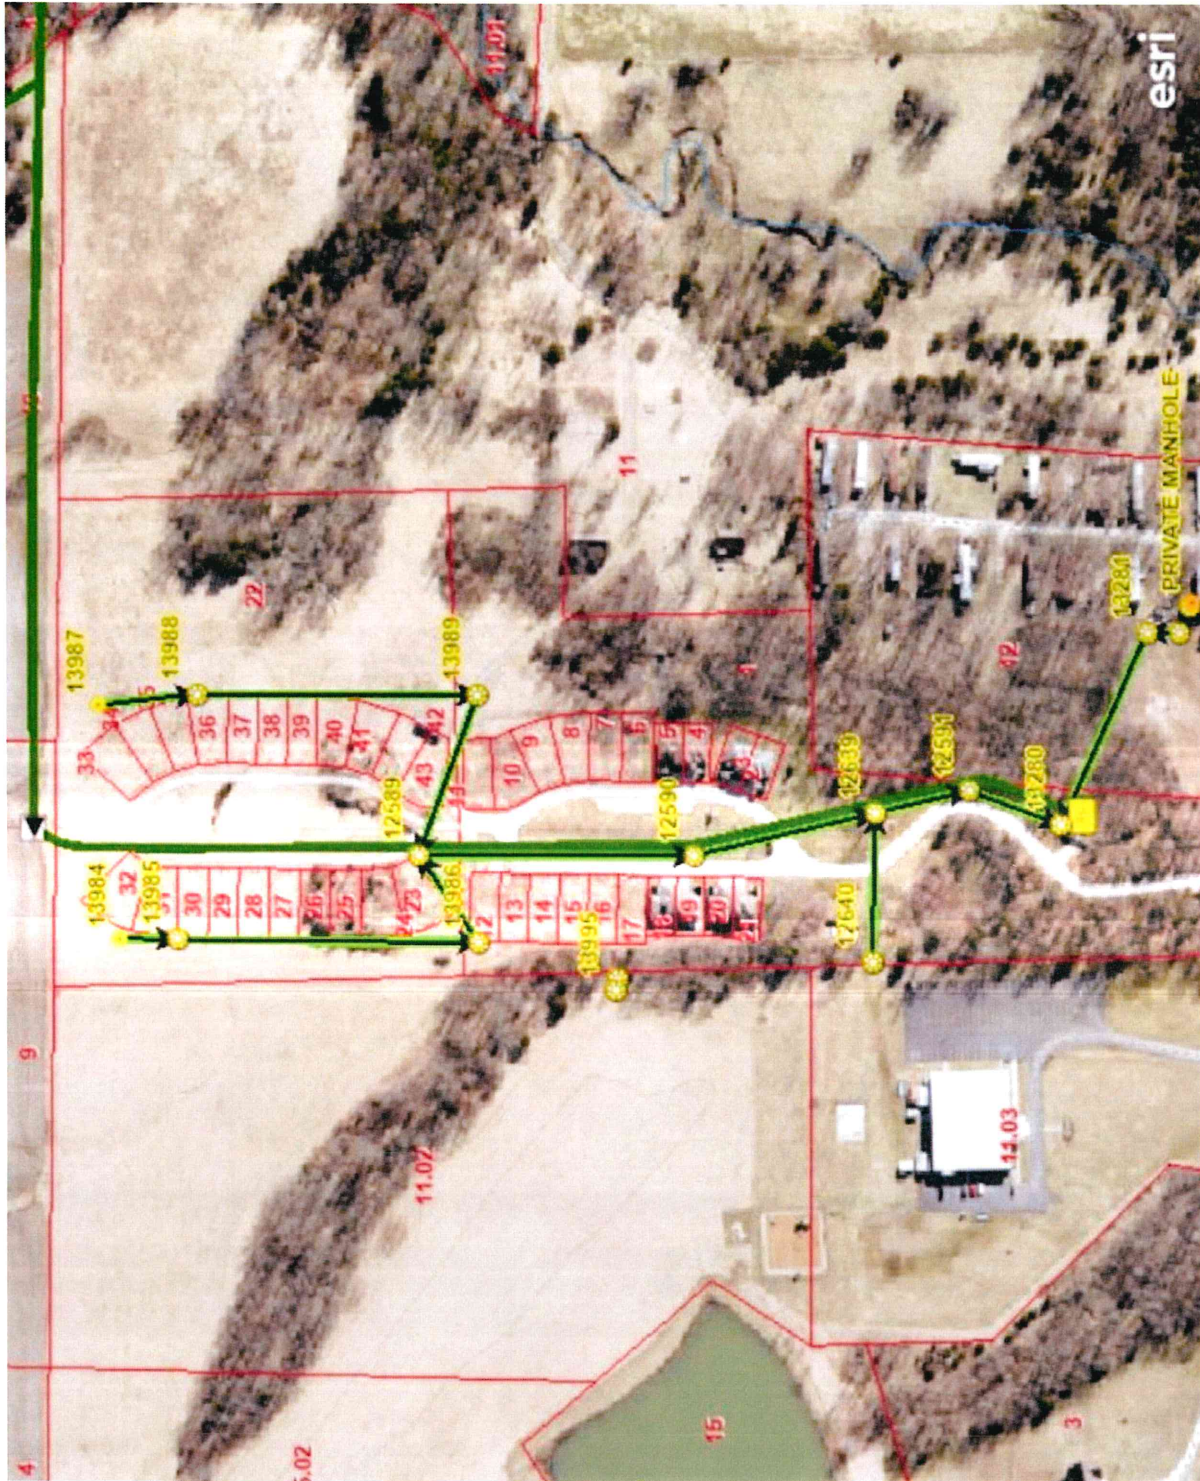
Existing Collection System – Matha's Grove Subdivision
